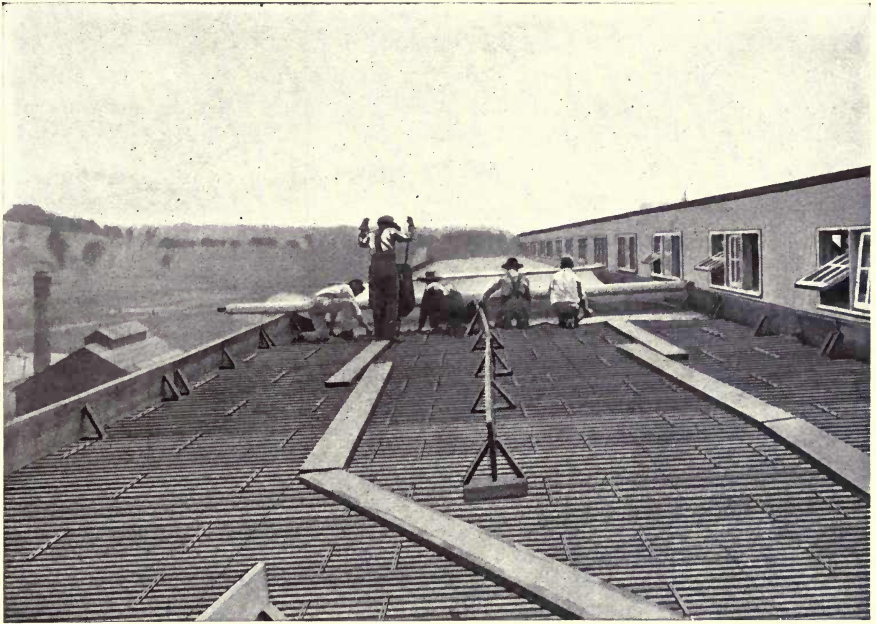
Placing of Ferroinclave Roof. (See p. 185.)
